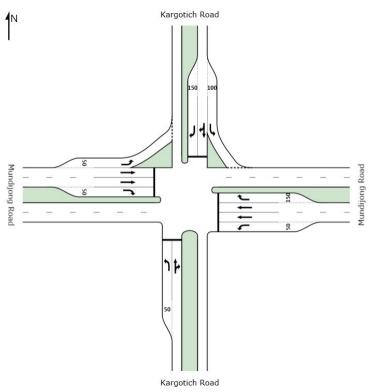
Mundijong Road/Kargotich Road Intersection Layout – Signalised Configuration
